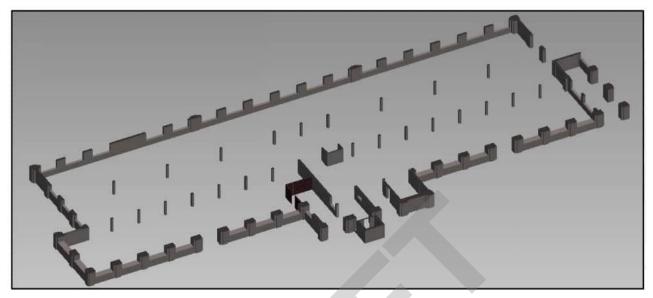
Cutaway showing walls and columns at the ground floor level at GNS
